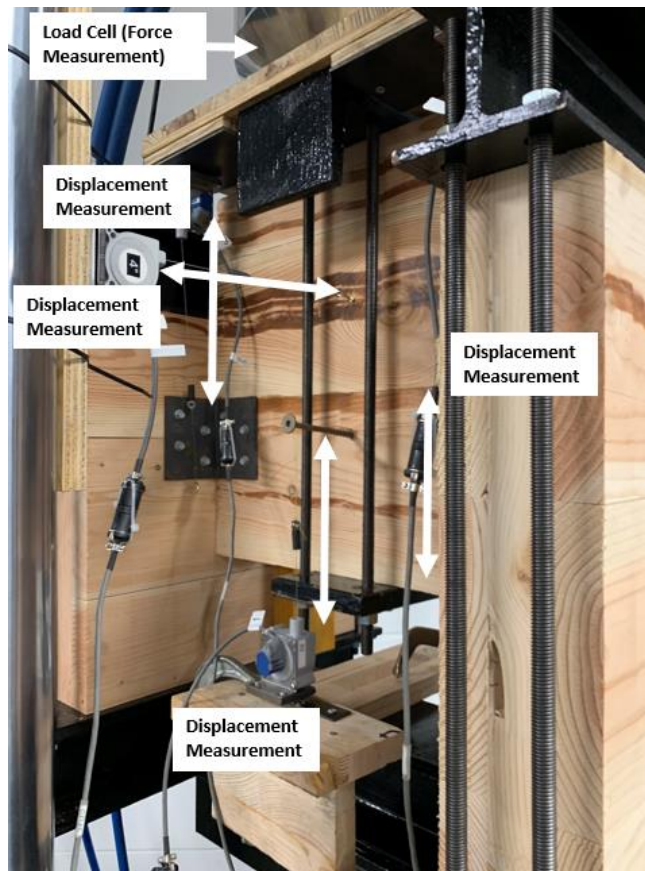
View of Wall-to-Floor Test Instrumentation
